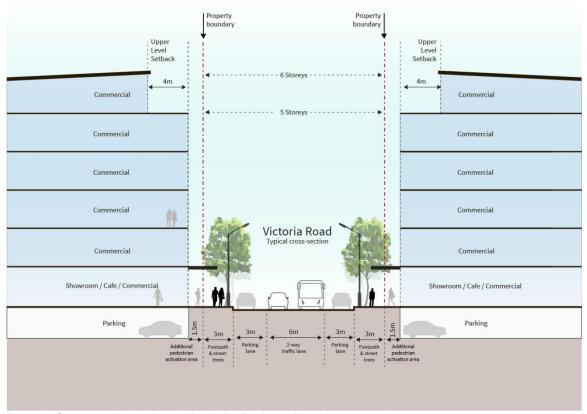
Street section 2 - Victoria Road (B5 Business Development zone)
